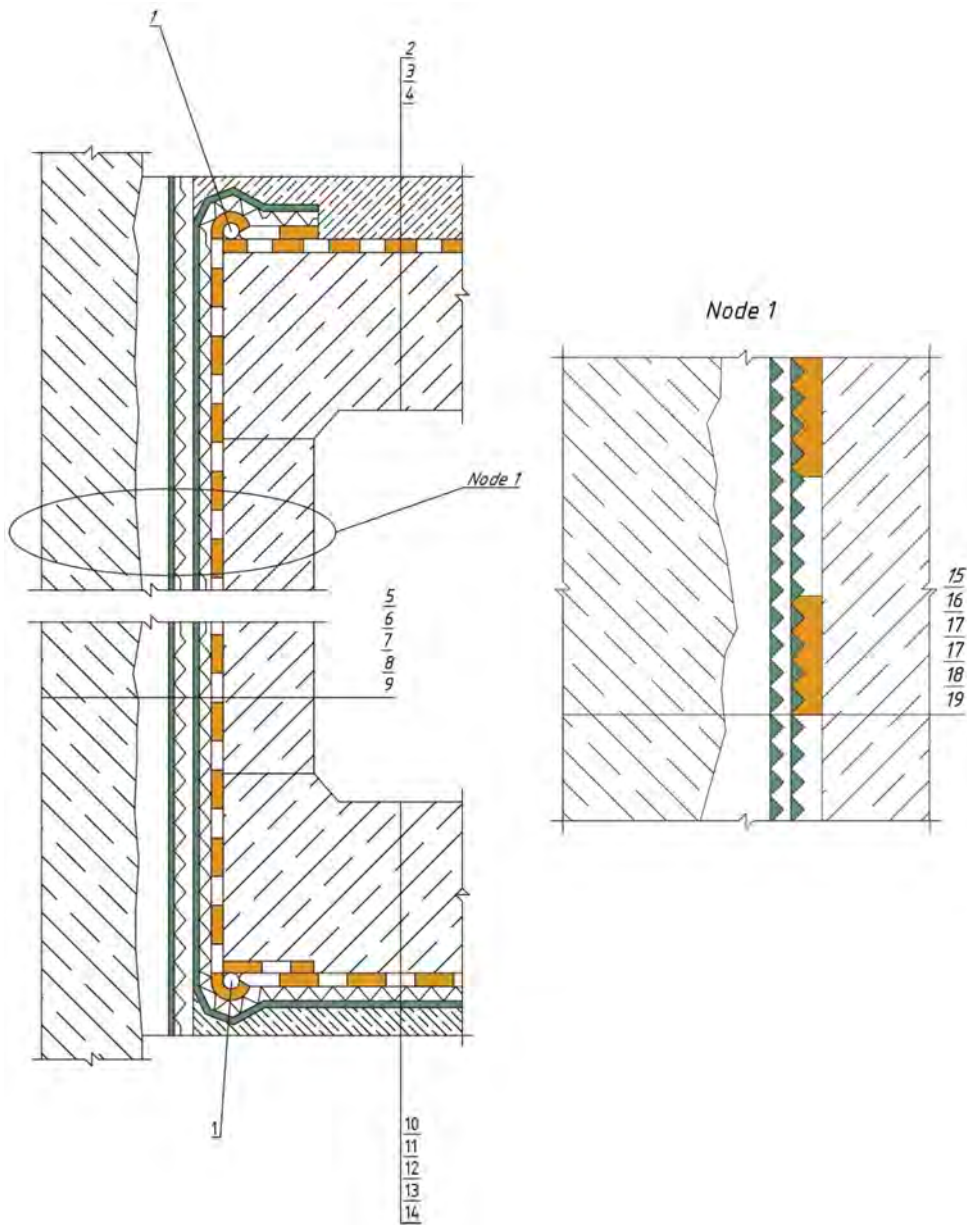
Waterproofing with two-layer sprayed waterproofing coatings with adhesion to freshly laid concrete of the monolithic wall construction of an underground structure without backfill cavities (Node 1): 1 – compensating loop; 2 – protective layer of concrete on mesh; 3 – sprayed waterproofing coating with primary and secondary adhesion; 4 – reinforced concrete floor; 5 – ditch sheeting – ‘diaphragm wall’; 6, 11, 16 – levelling layer (if necessary); 7 – two layers of geocomposite material; 8 – waterproofing coating with primary and secondary adhesion applied to the geotextile of the geocomposite material; 9 – reinforced concrete wall; 10 – concrete buckle plate; 11 – protective sand cement screed; 12 – waterproofing coating with primary and secondary adhesion applied to the geotextile of the geocomposite material; sprayed waterproofing coating with primary and secondary adhesion; 13 – geocomposite material; 14 – concrete bedding; 15 – ditch sheeting - ‘diaphragm wall’; 17 – geocomposite material (polyethylene film + geotextile, facing a layer of polyethylene film to the ‘diaphragm wall’); 18 – sprayed waterproofing coating with primary and secondary adhesion applied to a geotextile geocomposite material; 19 – concrete load bearing wall.
